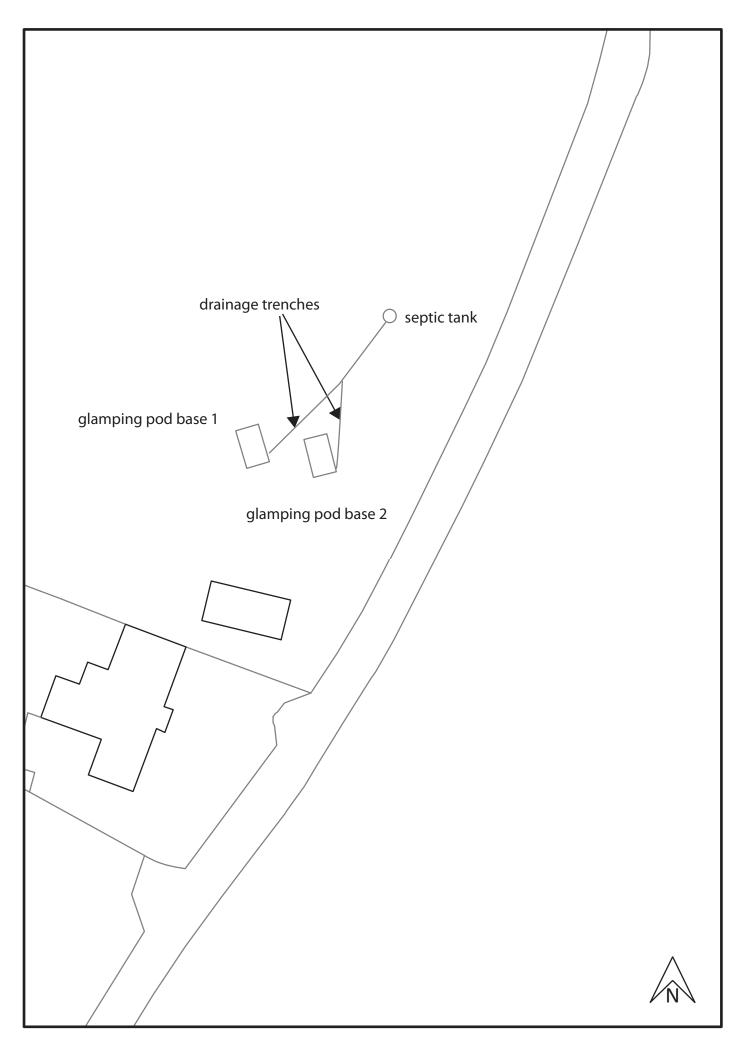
Sketch Plan locating glamping pods, drainage trench and septic tank. Not to scale.
